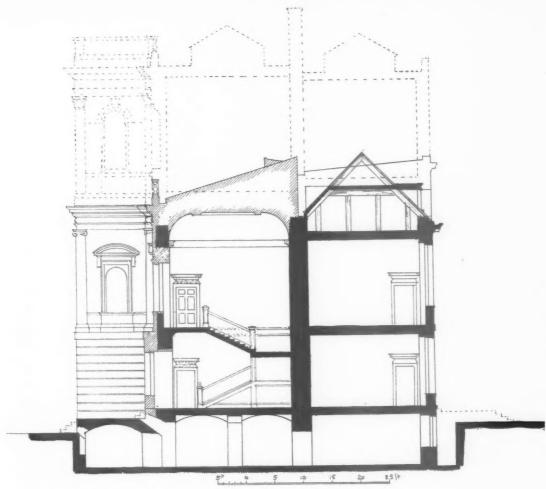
SECTION THROUGH BURLINGTON HOUSE,
